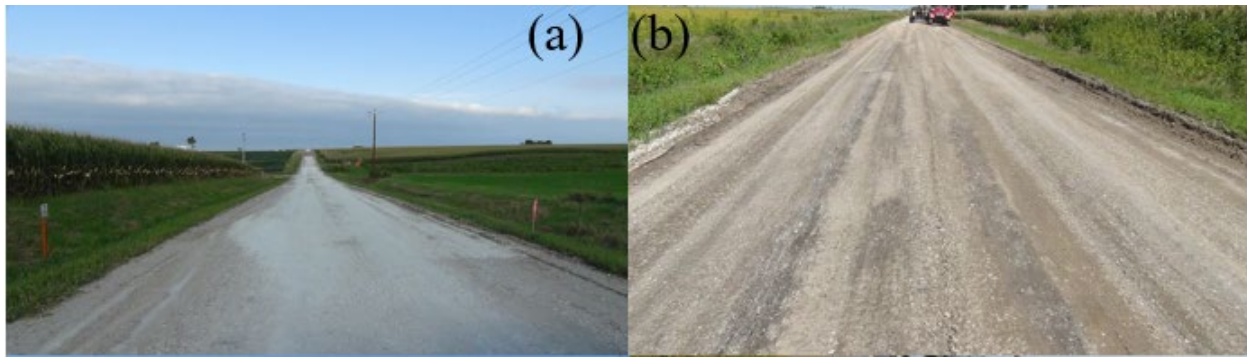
BASE ONE sections at end of construction: (a) Washington and (b) Hamilton County
